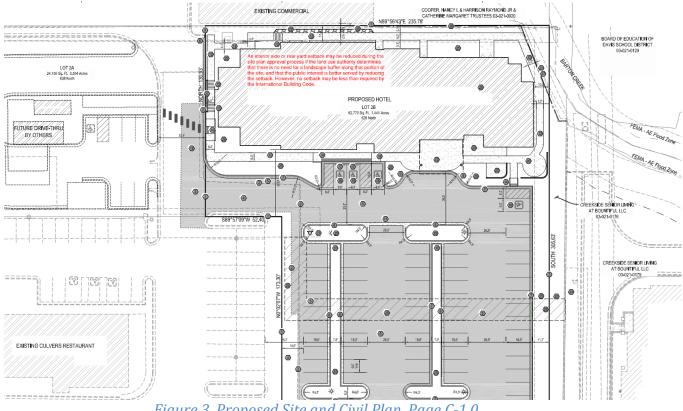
Proposed Site and Civil Plan, Page C-1.0
